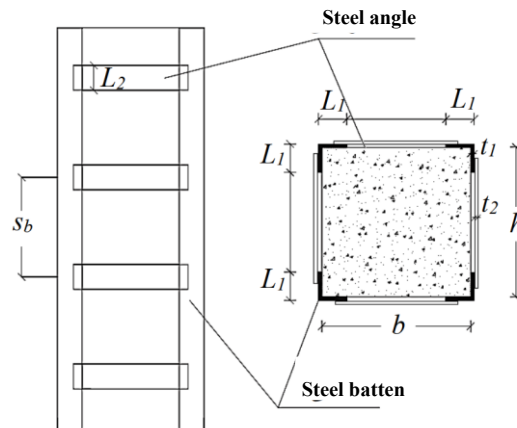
Specimen of a reinforced concrete column strengthened with a steel angle and batten system.
